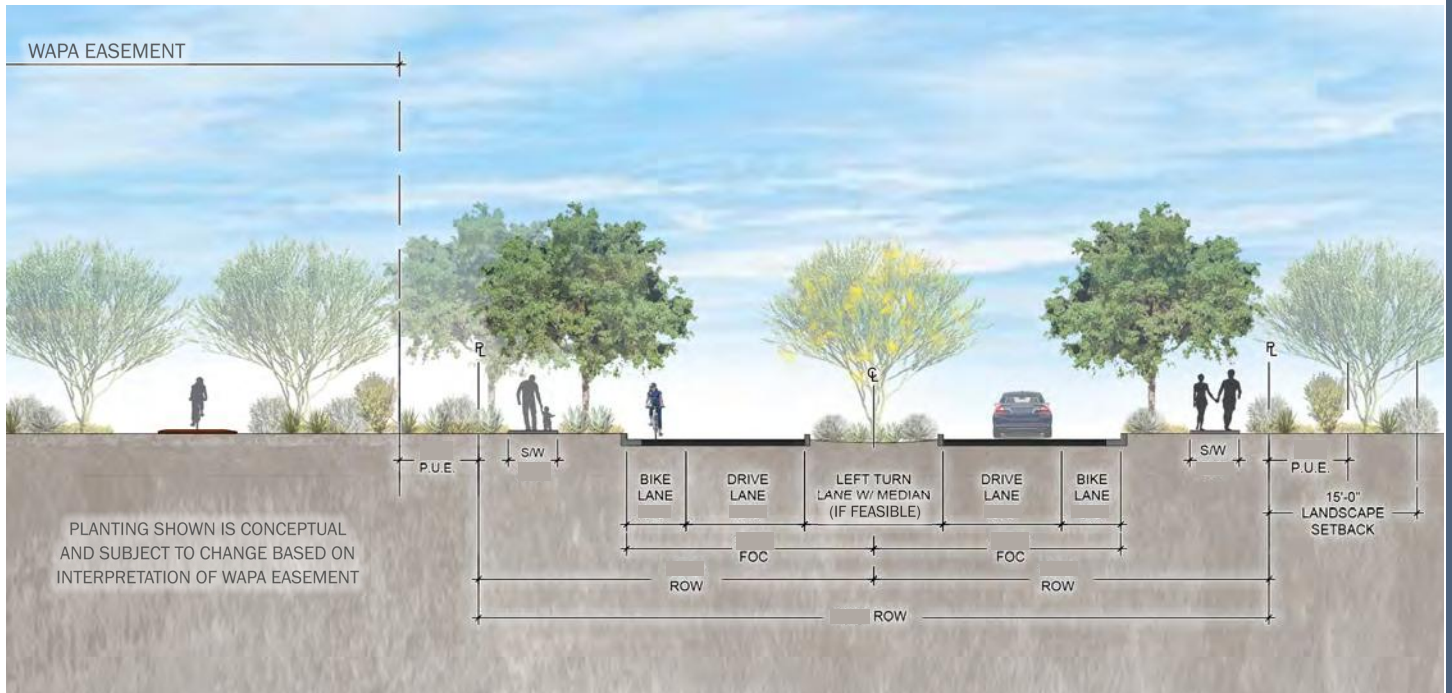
Conceptual Street Section - Gila Foothills Parkway Southern Segment (View Looking North)
